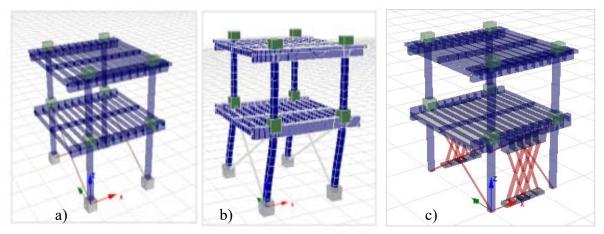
SeismoStruct structural model of the ILVA-IDEM module n. 5 (a), deformed shape of the bare structure under monotonic loading at the first floor (b) and the module upgraded with SPSWs (MSM03-BC strip model) (c).
